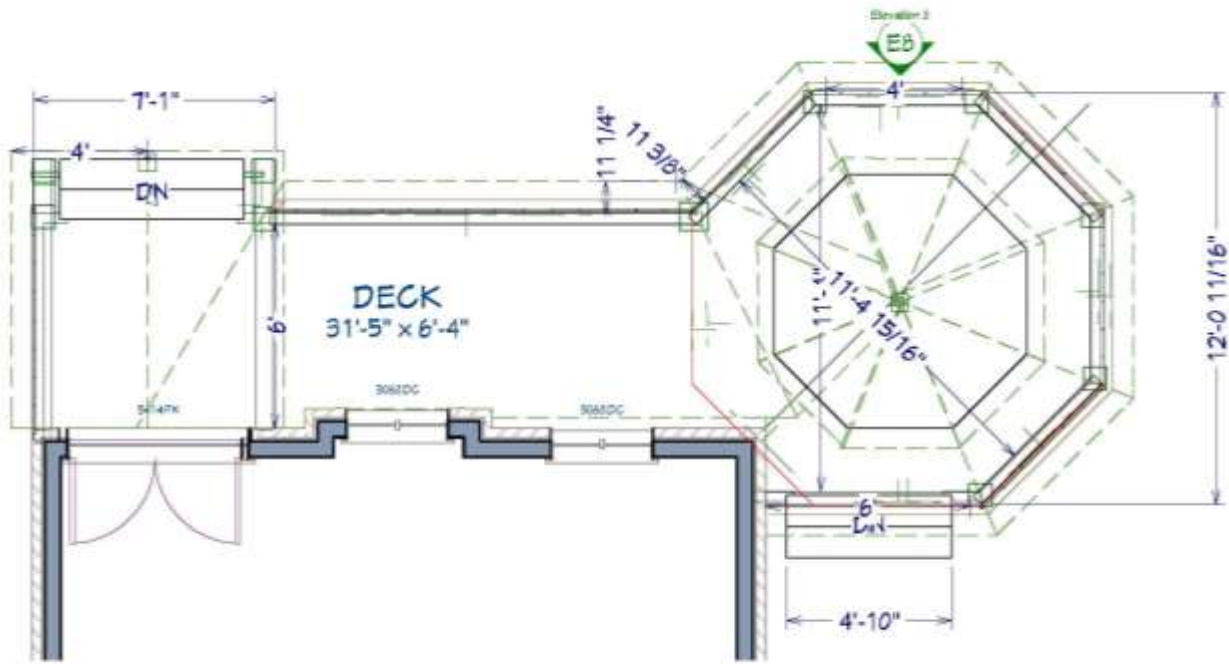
Architectural plan drawing of new porch at 529 Princess Avenue
